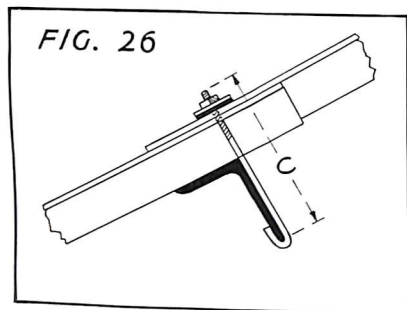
$\frac{1}{4}$ " Galvanised Hook Bolts for fixing to angle iron purlins.
